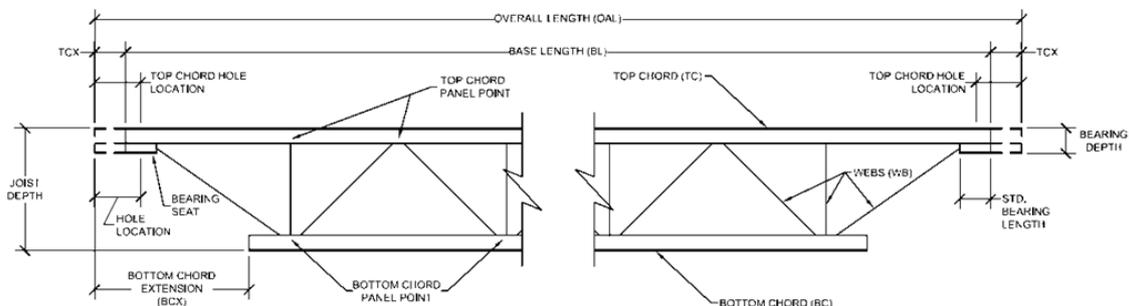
Open web steel joist conventional configuration (Extracted from VULCRAFT)⁵⁴
